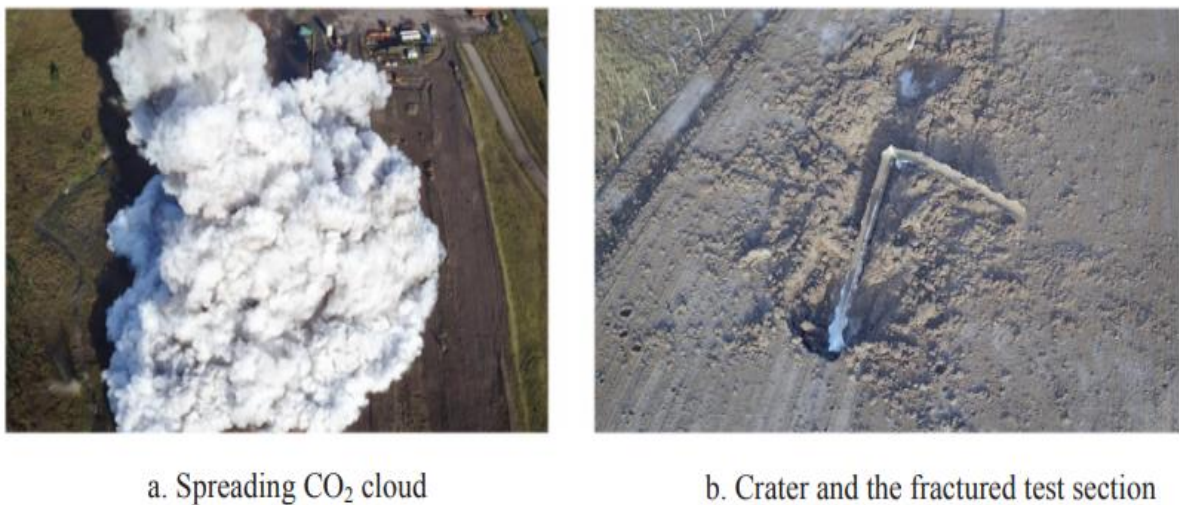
“Aerial views of the spreading CO₂ cloud, crater formed by CO₂ explosion, and the fractured test section.”, (Ref. [14])
